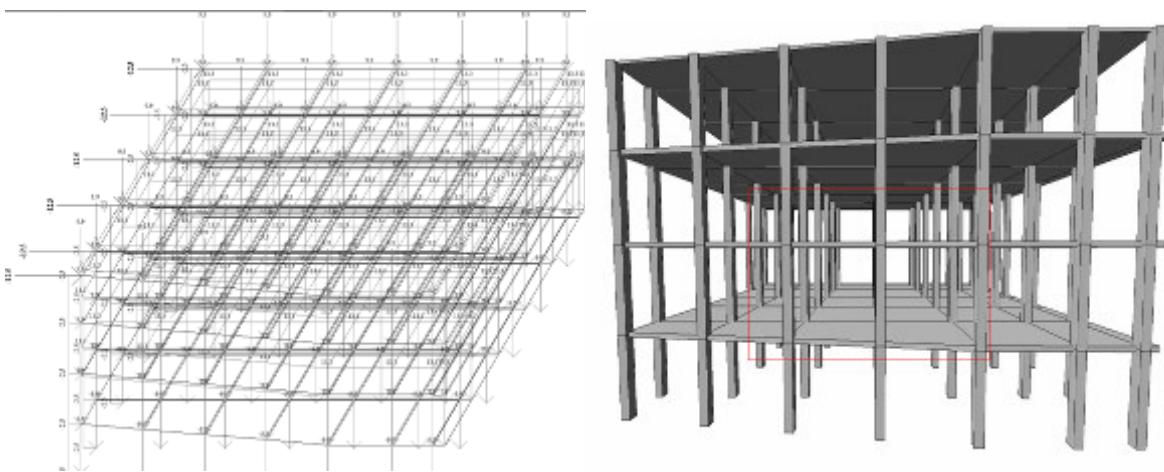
The design model of the three-story building with beamless reinforced concrete overlap
